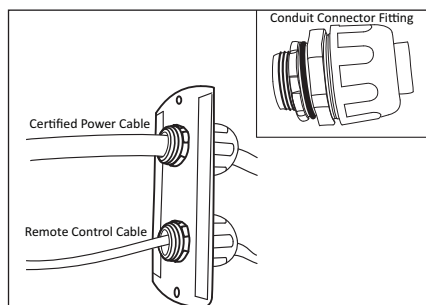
Properly install the power and remote cables through the conduit connector fittings in the conduit plate.
